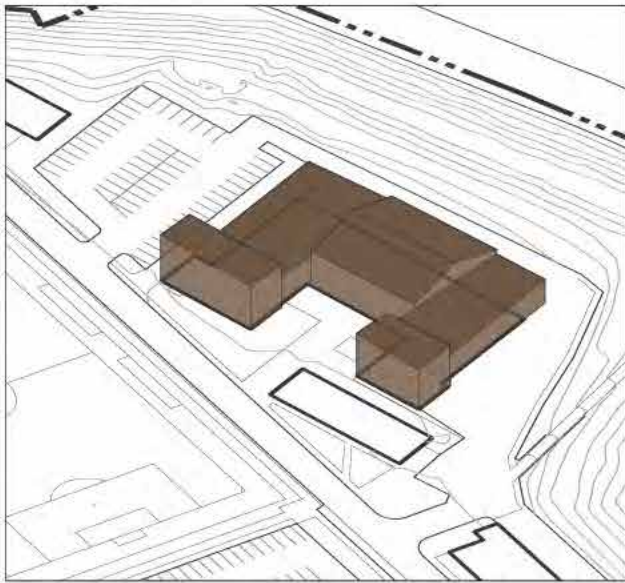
Axonometric and Site Plan of renovated Huntley gymnasium
